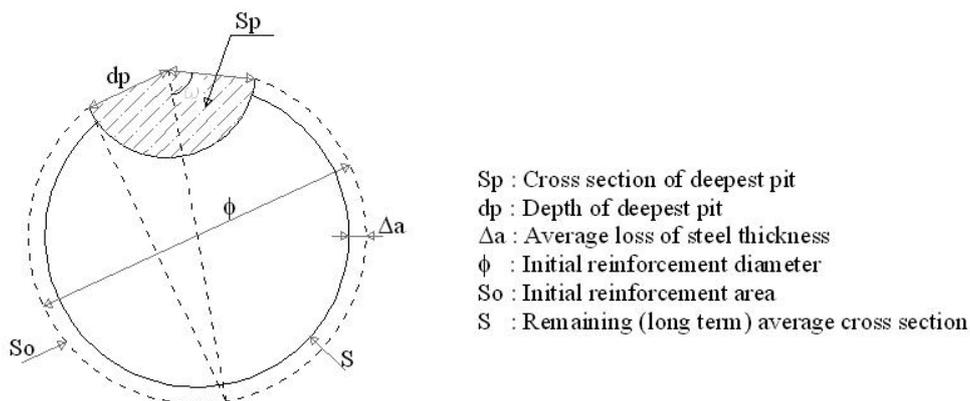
Corroded rounded bar cross section “Smith et al (1996)”
